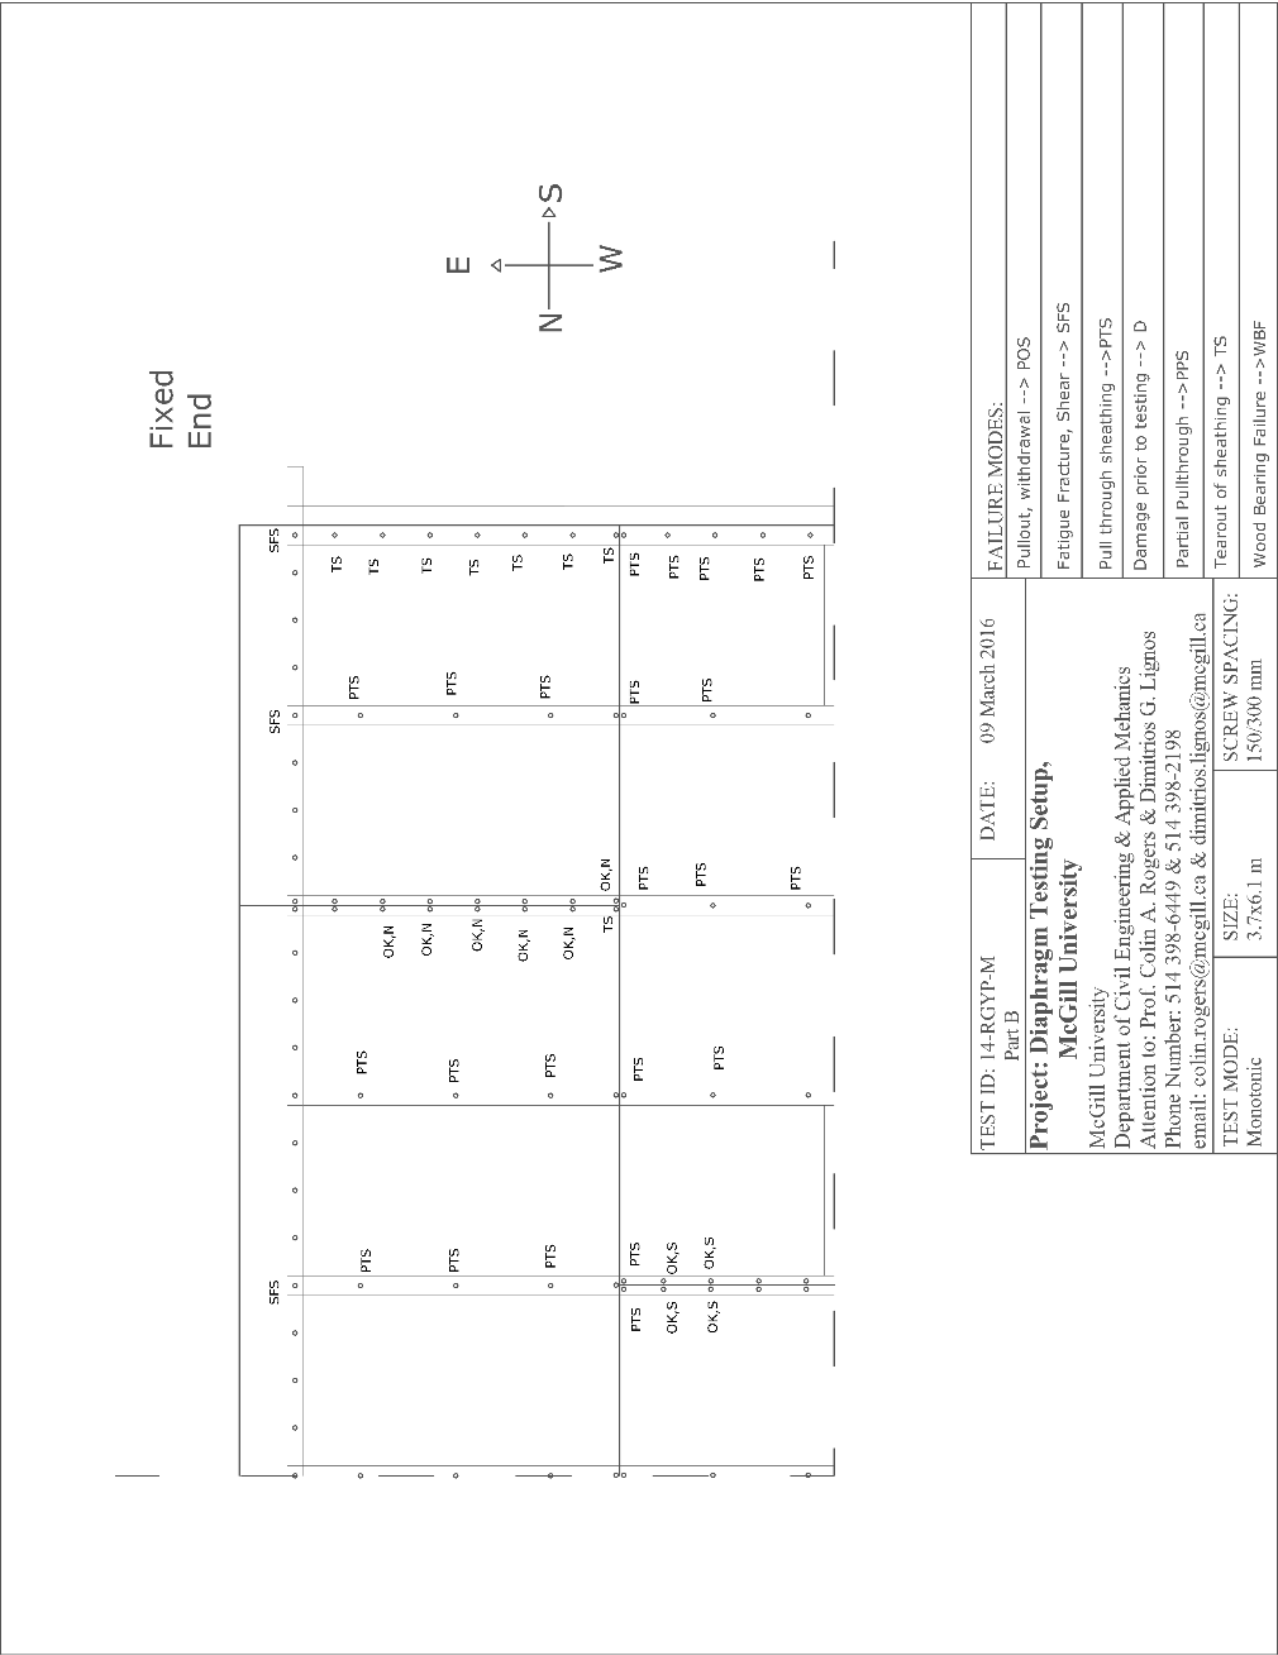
Sheathing Fastener Failure Modes Part B Specimen 14-RGYP-M
